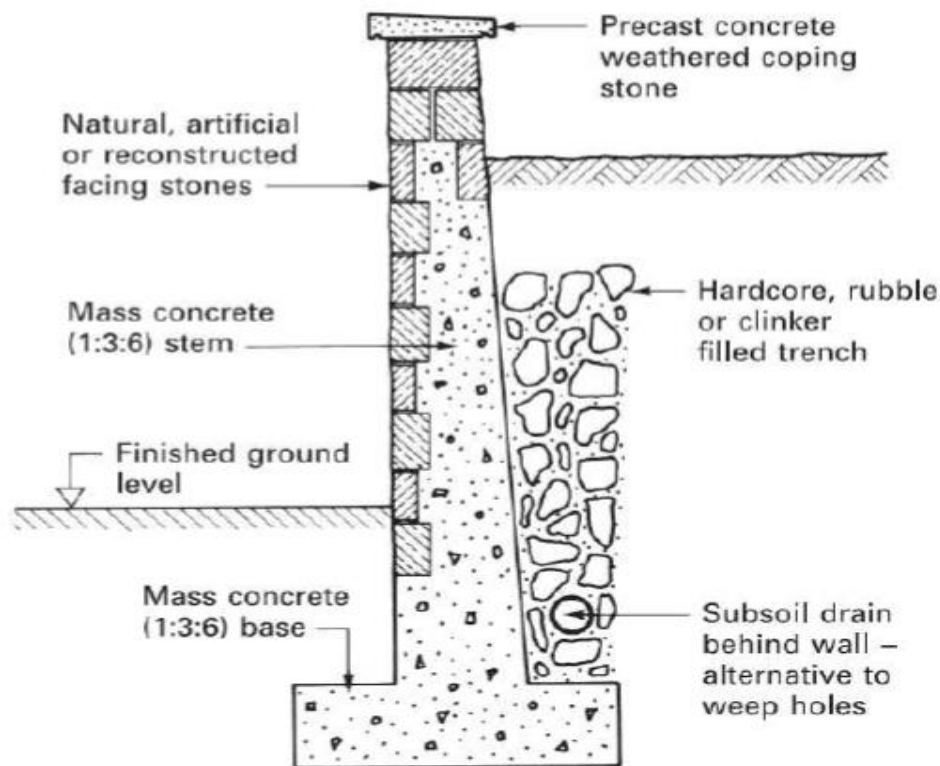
Mass Concrete Retaining Wall with Stone facings [5].
